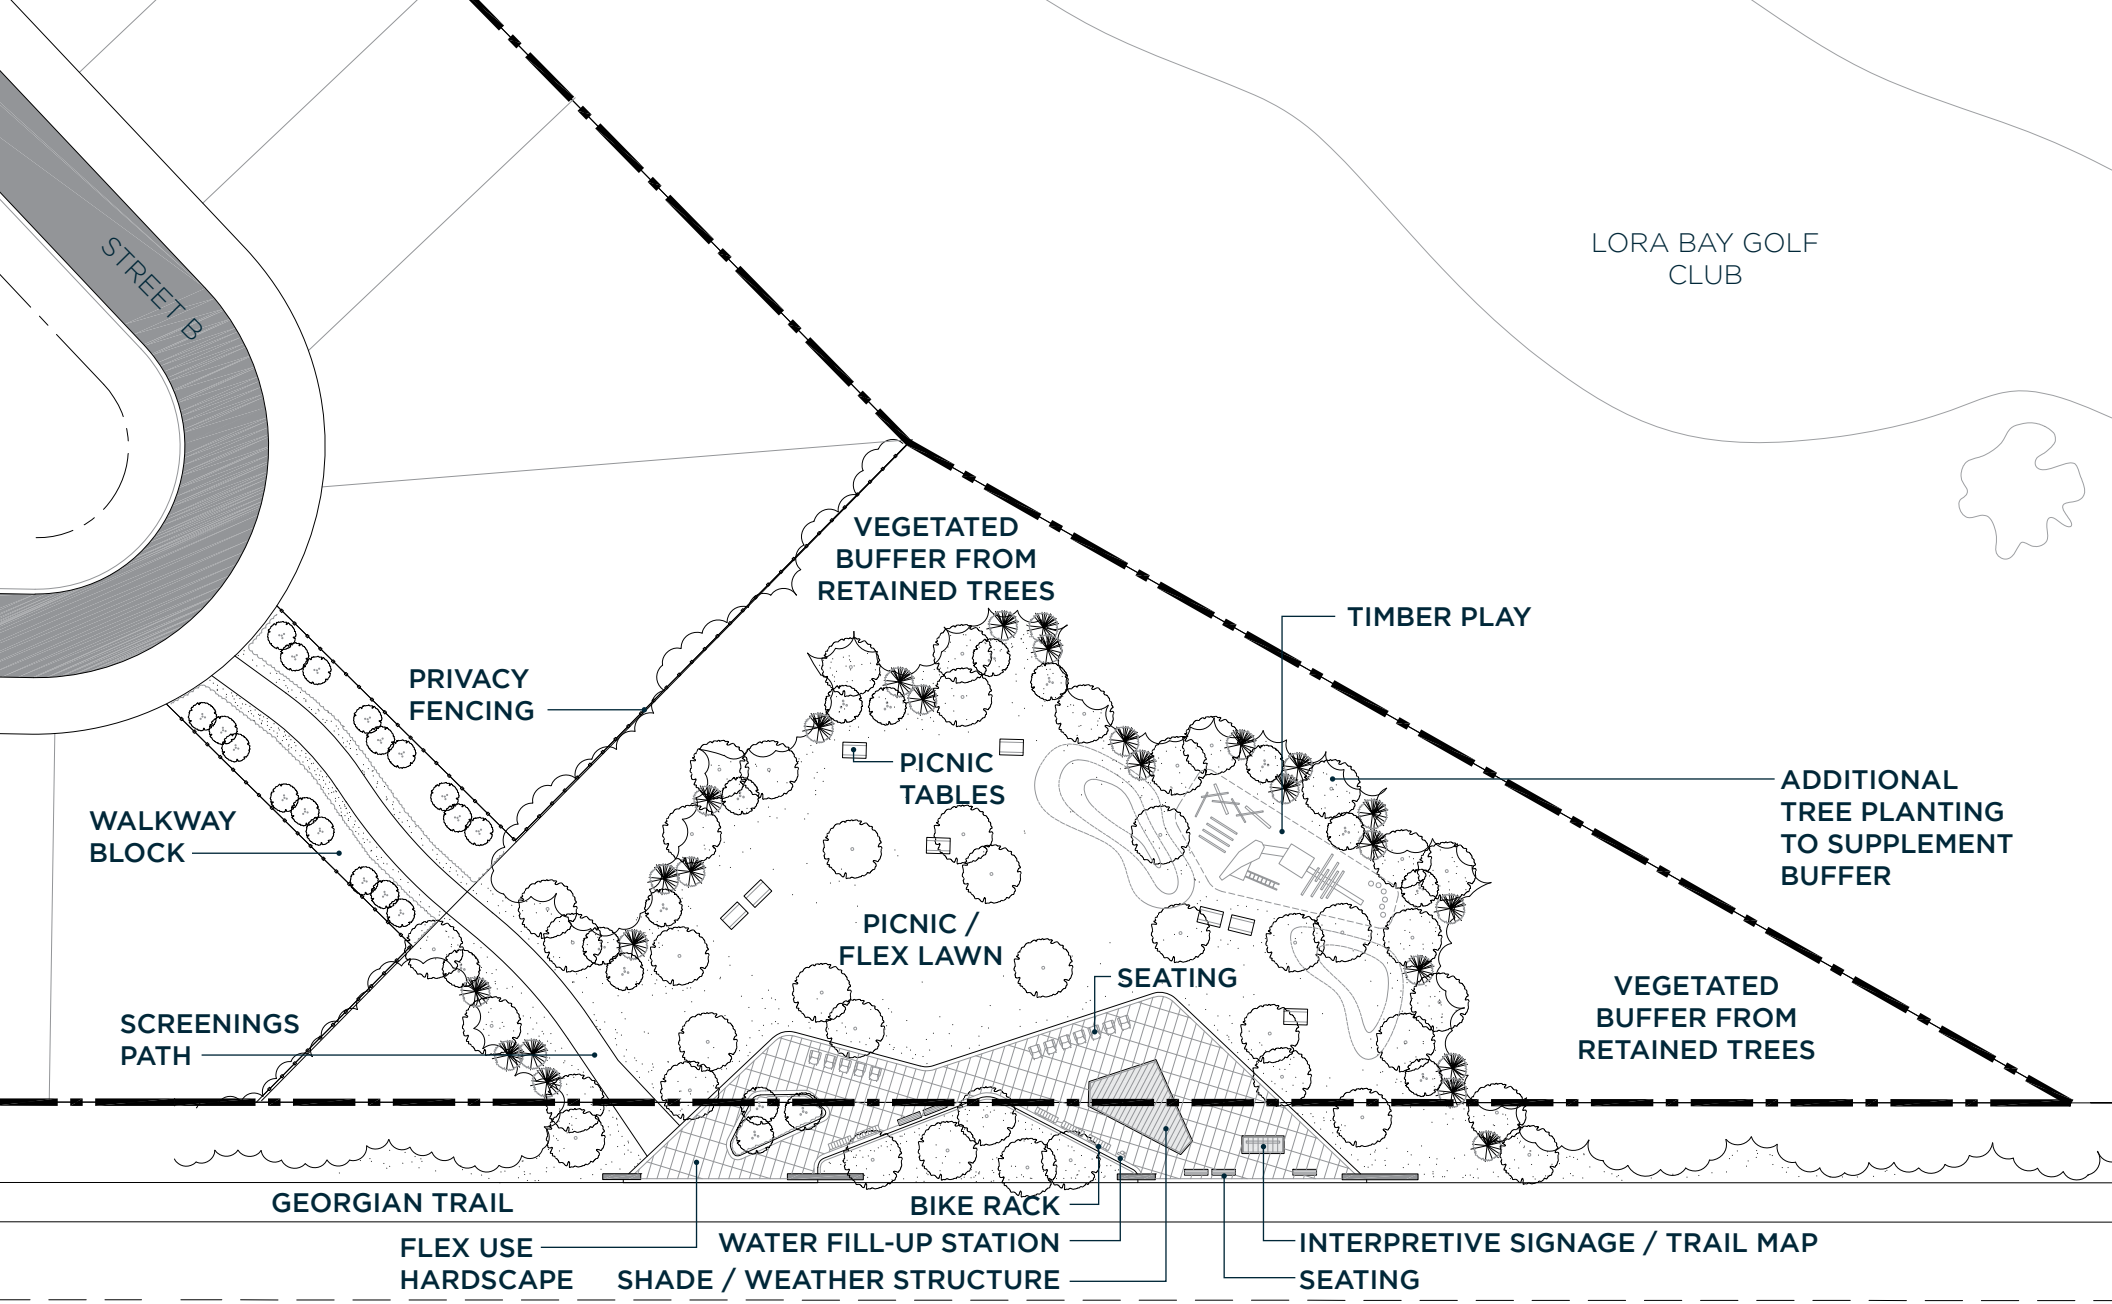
Conceptual Neighbourhood Park Facility Fit Plan (0.62 ha)
